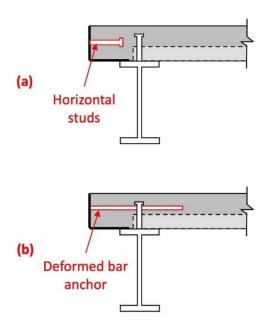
Drawing associated with Question 10 on if there were horizonal studs or deformed bar anchors welded to the bent plate.
